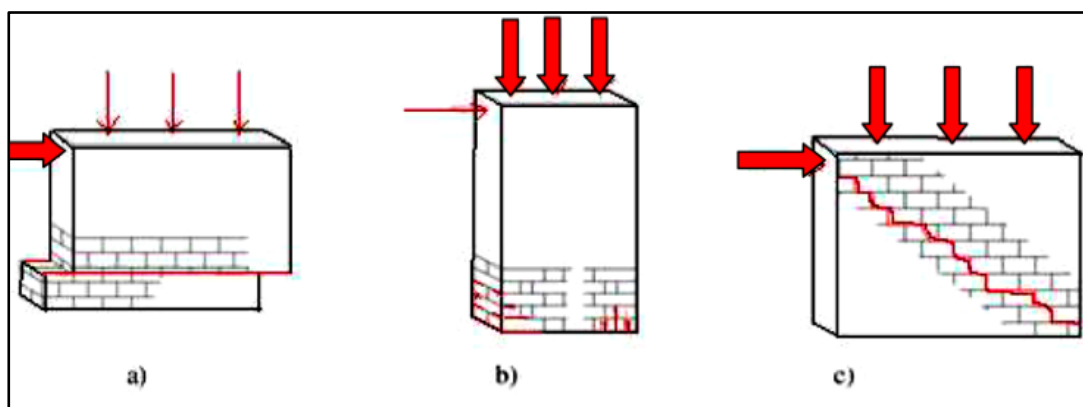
Failure modes of URM shear wall: (a) sliding; (b) rocking (with toe crushing) ;(c) diagonal cracking (through brick unit and mortar joints)
